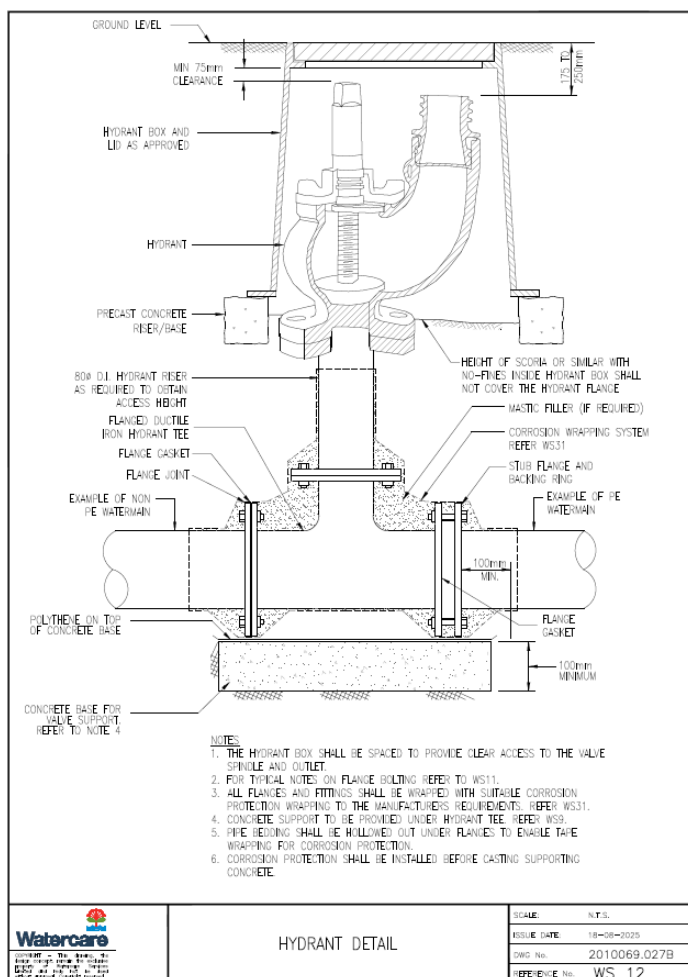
Example of assembled PE stub flange connection with backing ring, connecting to a ductile iron fitting.
